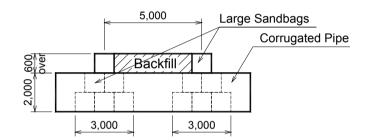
Cross Section of Fording Point of Construction Road
